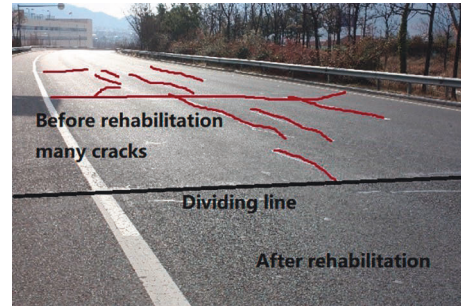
Transverse and longitudinal cracks on the surface of the pavement in the entrance section of the Yangkou tunnel.
